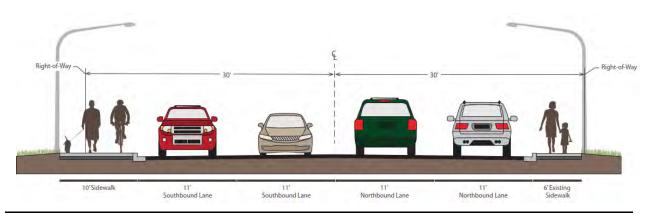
Proposed Typical Section – 13th Street to 17th Street
